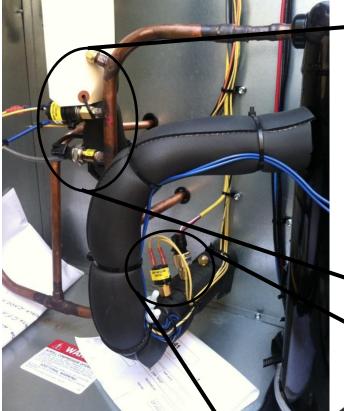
Schrader Valves Installed on Discharge and Suction Lines
